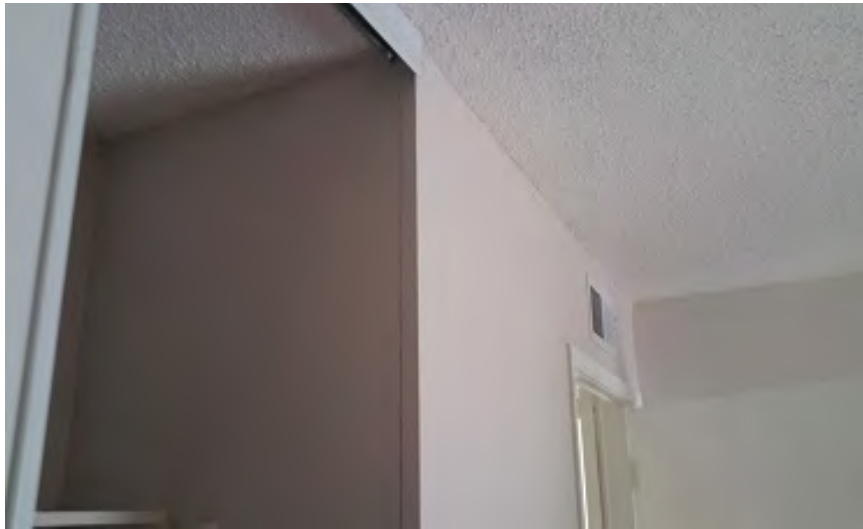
Unit 112: Crack in SE Corner of Living Room
